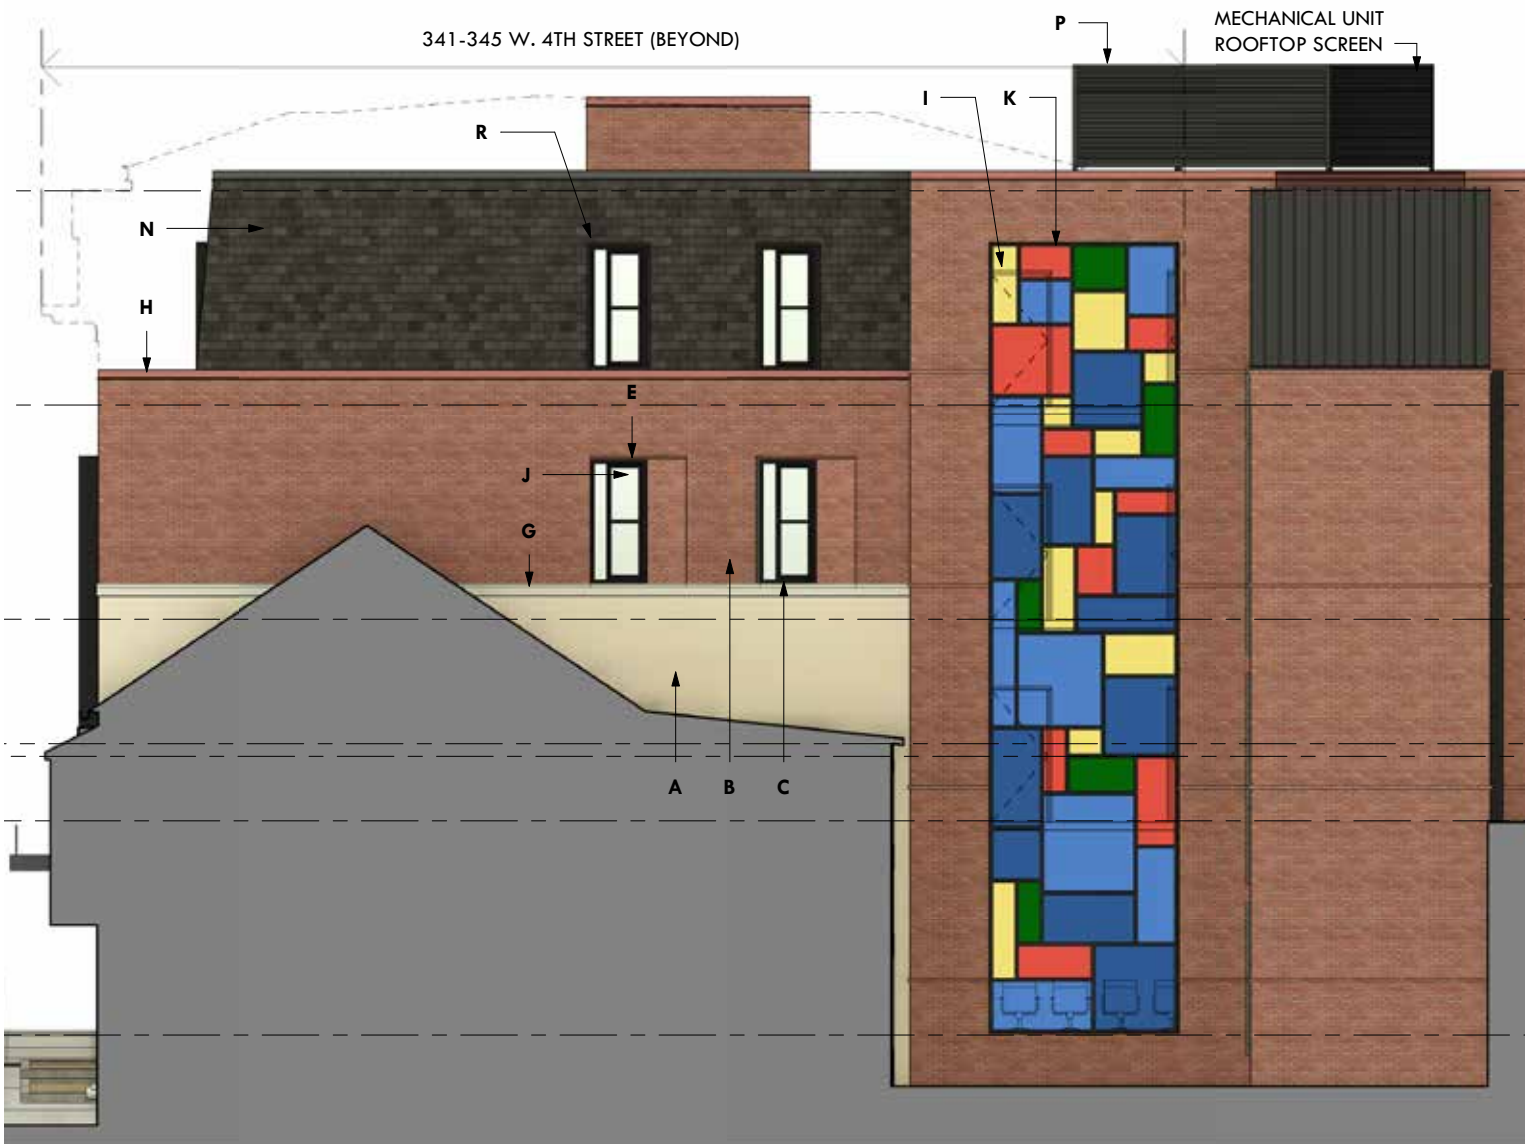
Proposed 335-339 West Fourth Street, East Elevation; Drawn by Spillman Farmer Architects
